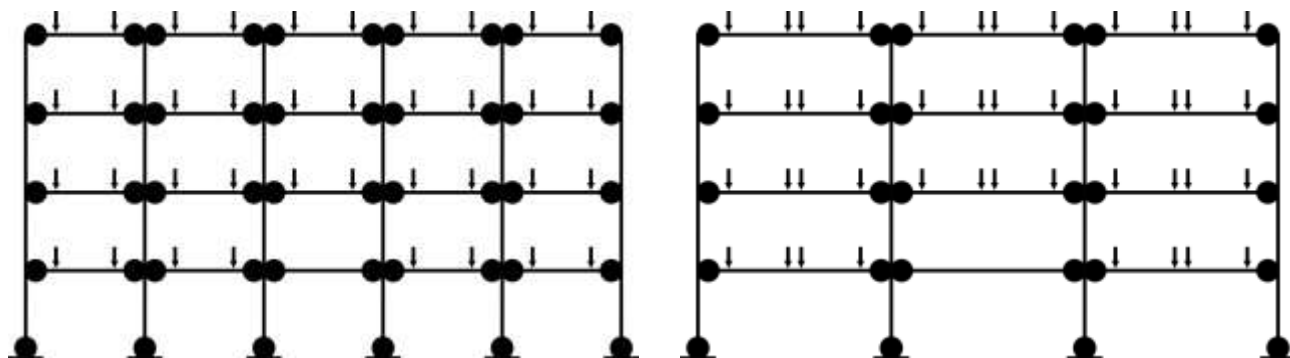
Typical loading pattern model for a rack system without bracing tower.
